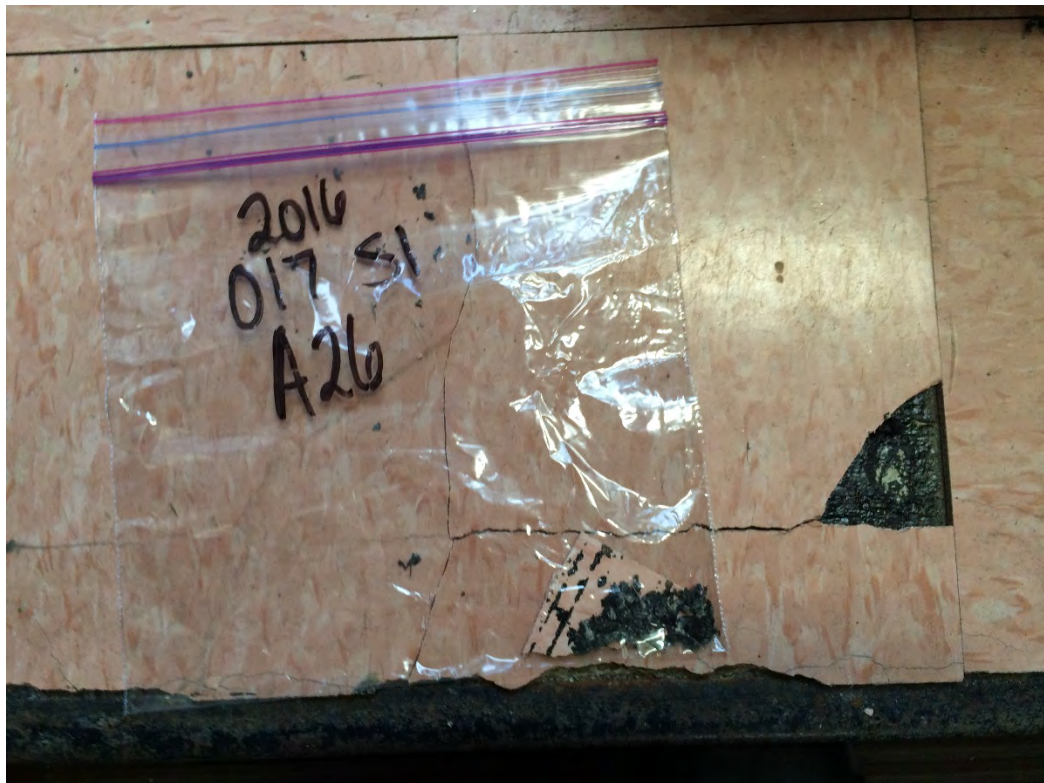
Asbestos sample A26, 12" x 12" pink vinyl floor tile and adhesive collected from O17-S1. No asbestos detected in tile or adhesive.
